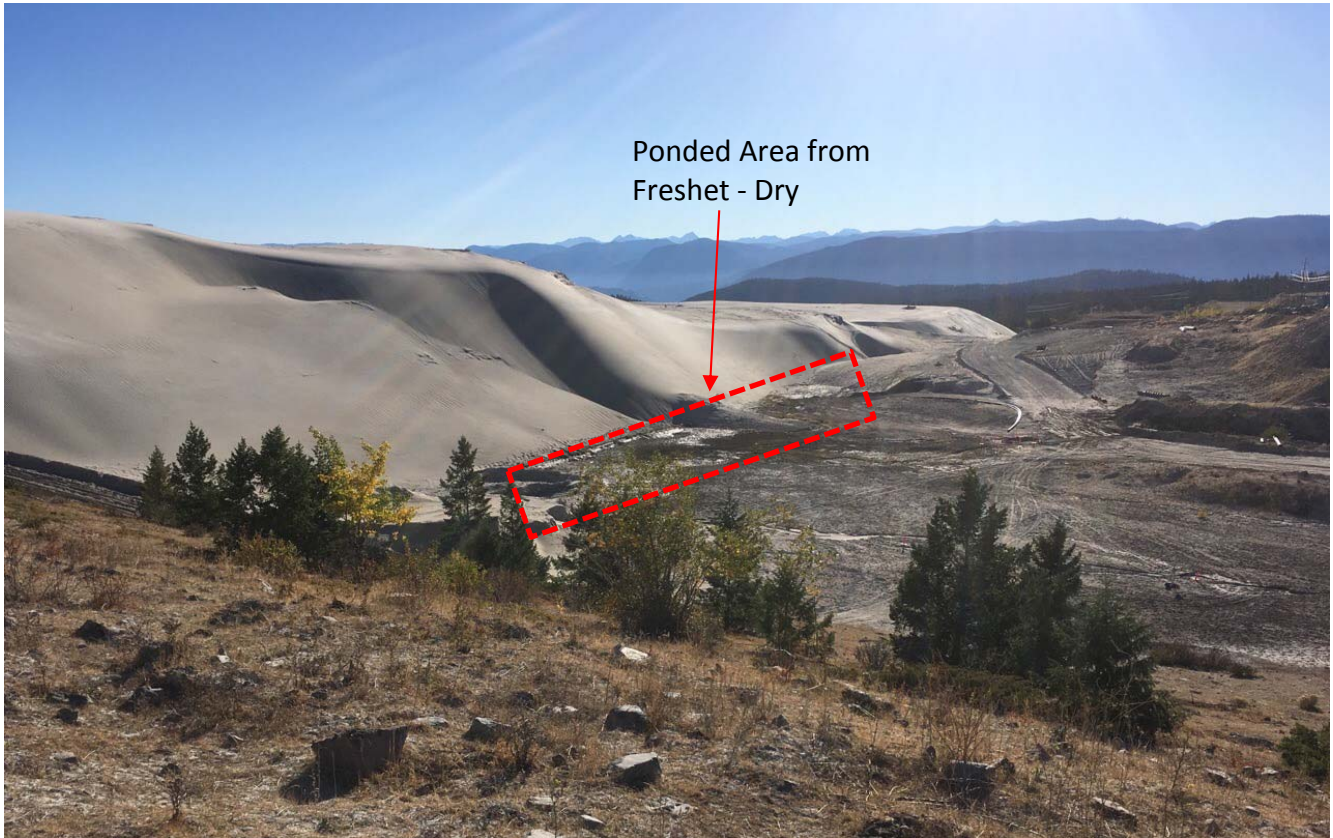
North Buttress Berm South Slope – Facing Northwest (LL-2017-19)
